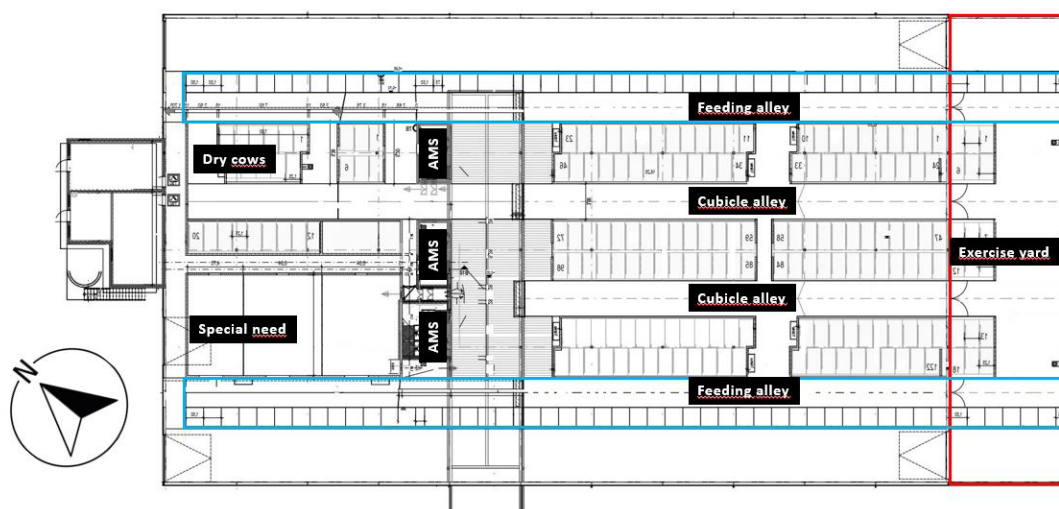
Floor plan of the barn on the study farm (the adjoining exercise yard is on the right and is framed in red; the feeding alleys are also marked with a blue frame)
